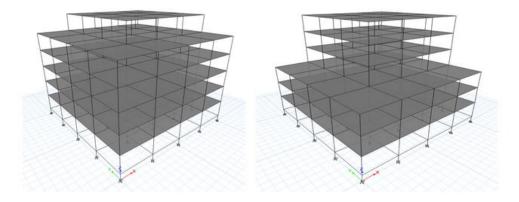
3D views of 6-storied upper and mid geometric irregular buildings
